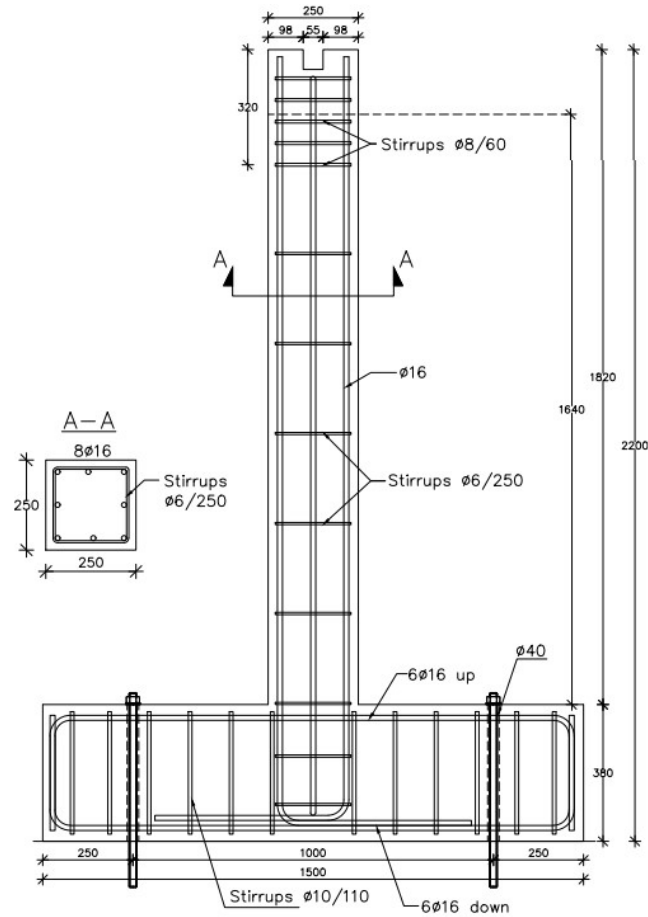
Column geometry and reinforcement details of the cantilever columns (dimensions in mm).
